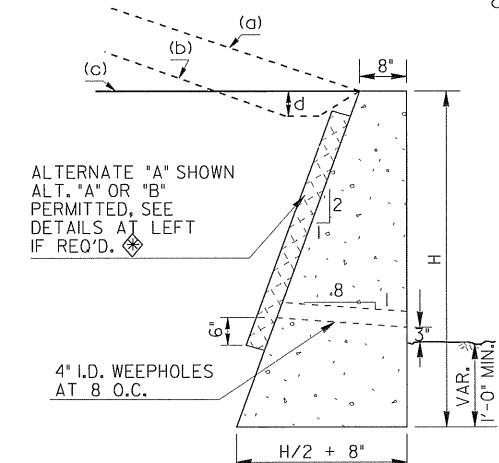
DETAILS OF RETAINING WALL TYPICAL SECTIONS
